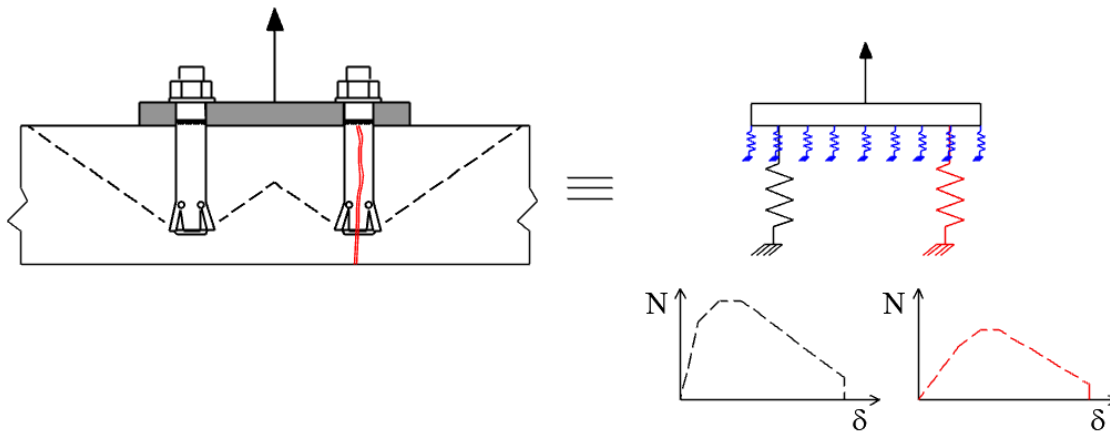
Spring properties for an anchor group of 1x2 configuration with one anchor in a crack, one anchor in uncracked concrete
